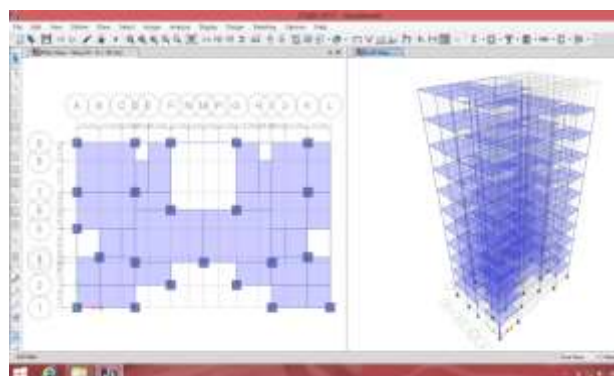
Window of ETABS showing plan and 3D view of structure
